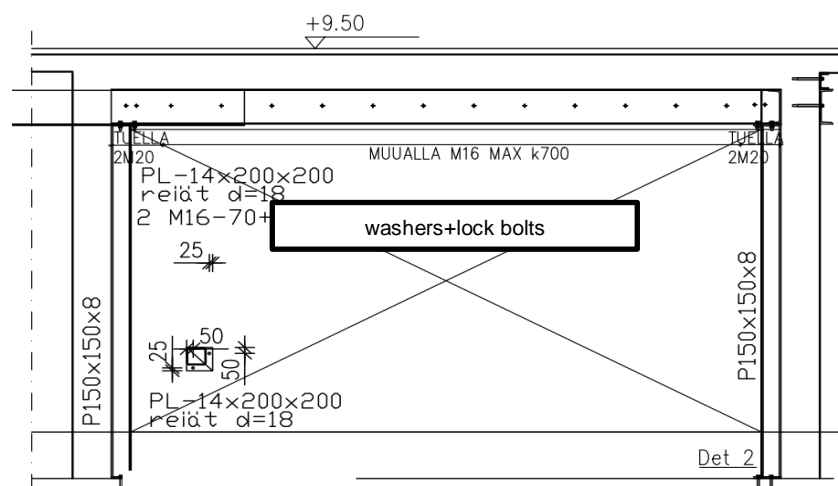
Example of strengthening of an opening with a steel beam and columns.
